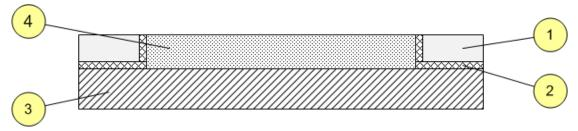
Construction example for the magnet foundation, if the original floor construction at the magnet installation site is based on a floating floor.
